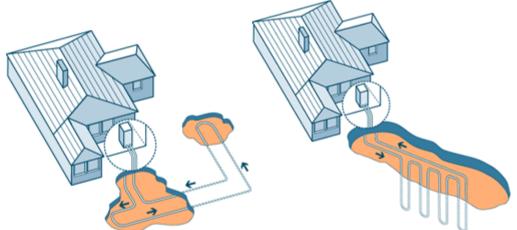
Groundsource heat systems. A horizontal, shallow loop system, B. Vertical loop system
